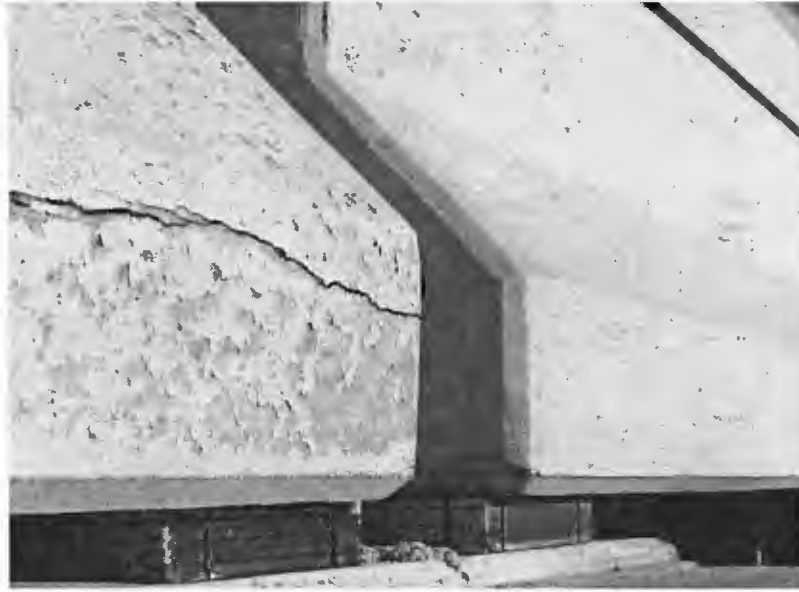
Contrast between damaged and undamaged girders at Location 1
